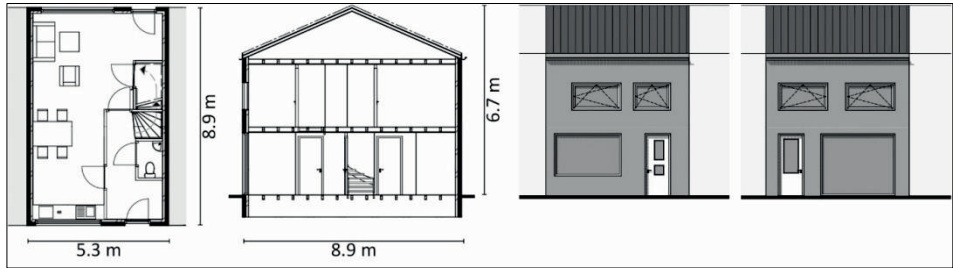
Terraced dwelling: floor plan, cross section and facades (front, back).
